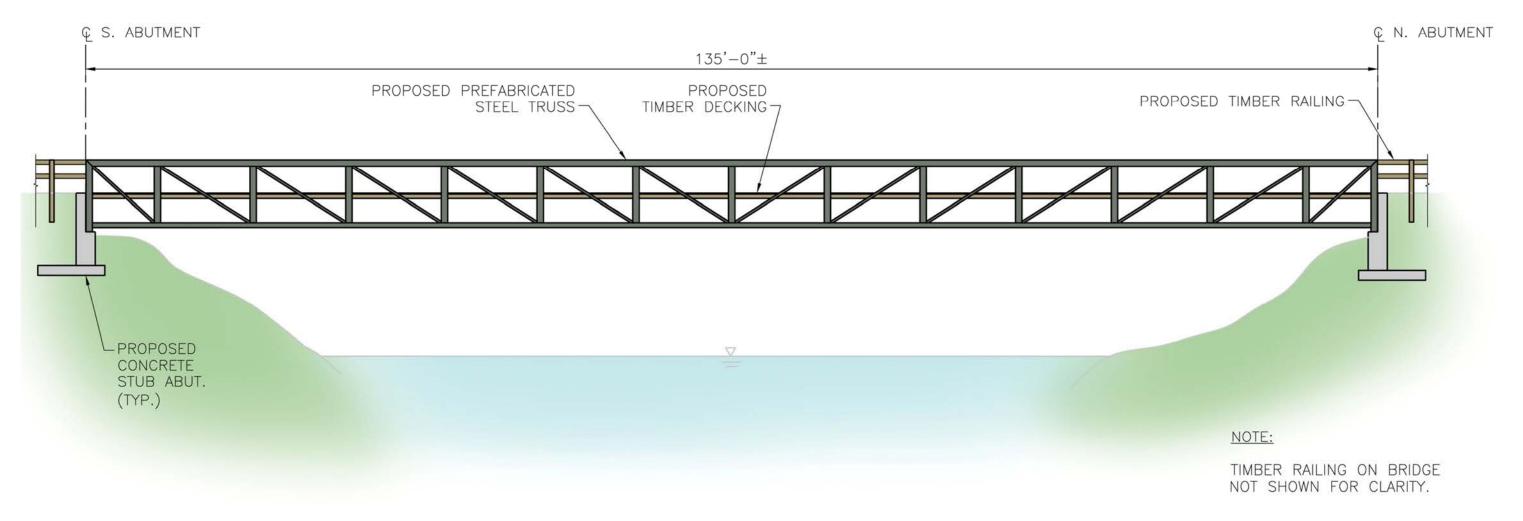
Alternative 2 – Replacement with Prefabricated Steel Bridge Structure Elevation View
